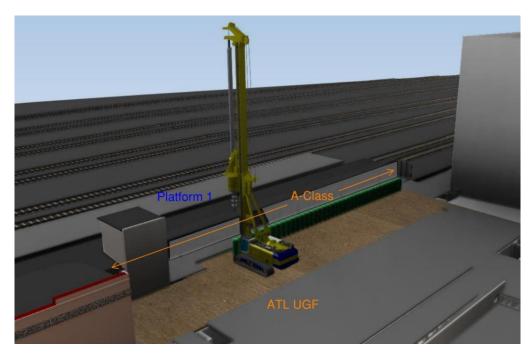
Example of piling rig in relation to Platform 1 A-Class Hoarding
